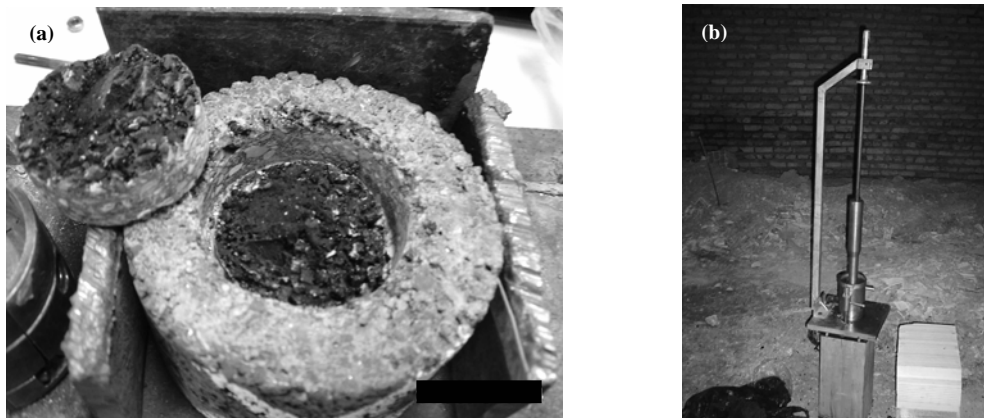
Drilled core section, a) Friction-Transfer test is applied on a Marshal Stability test specimen, b) Standard apparatus used to prepare Marshal Test specimens, (Hosseini, 2005)
